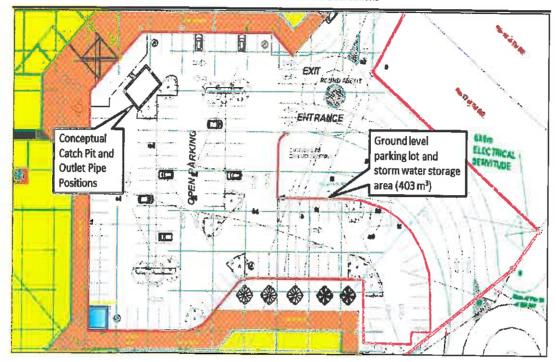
Conceptual Plan View of the Ground Level SWMP infrastructure
